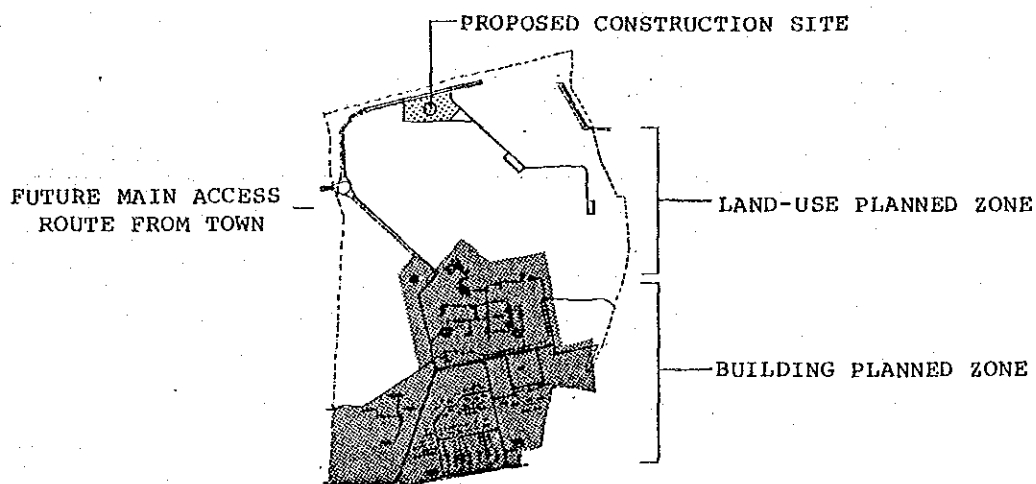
Scope of Sukolilo Campus Master Plan (1978)
